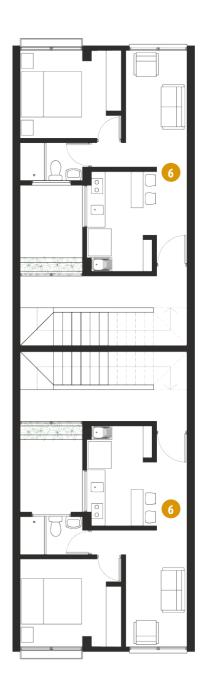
TYPOLOGY D\_FIRST FLOOR PLAN
